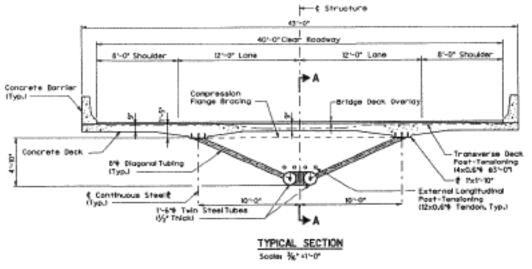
Typical Section of Warren Truss Bridge [24]
